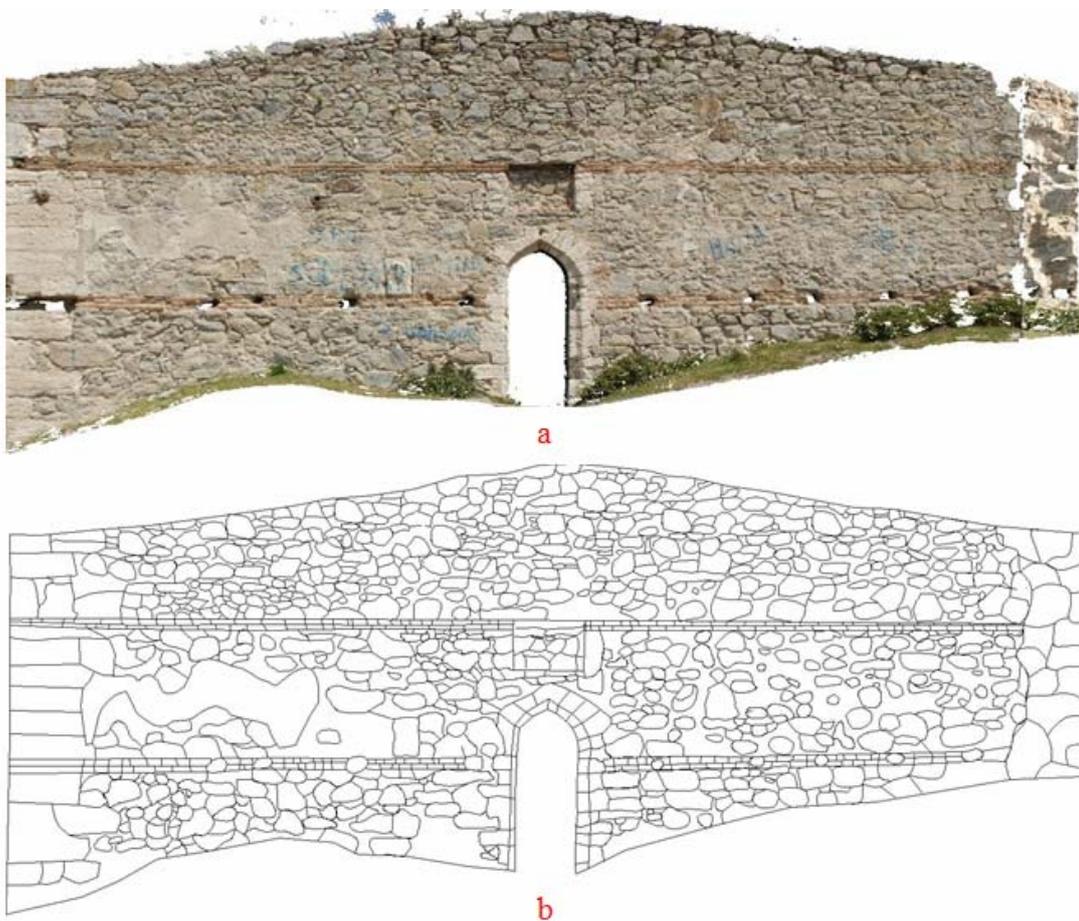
a: orthophoto image of front wall of the bath; b: 2D CAD drawing of front wall on orthophoto image.
